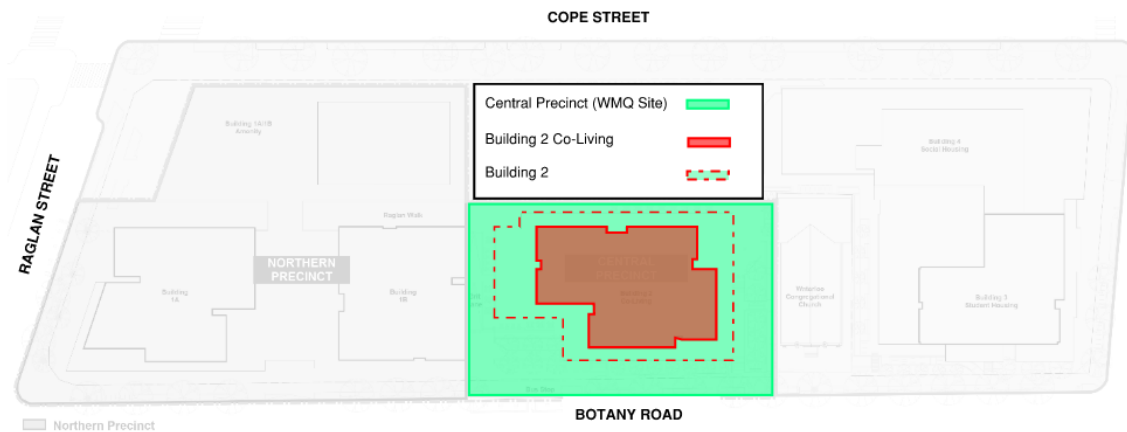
Site Plan – Central Precinct (indicated in green); Building 2(indicated in red dot lines)
